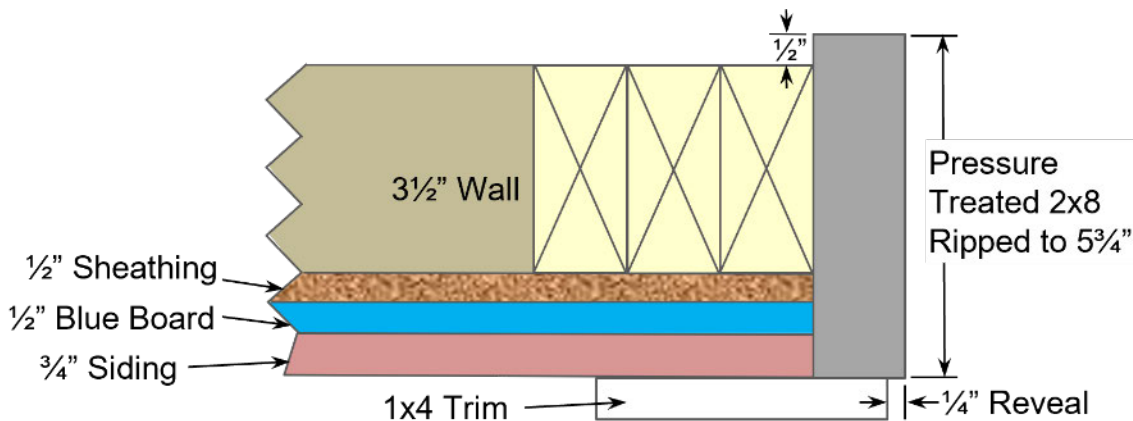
Placement of 1x4 Trim on Siding Wall
